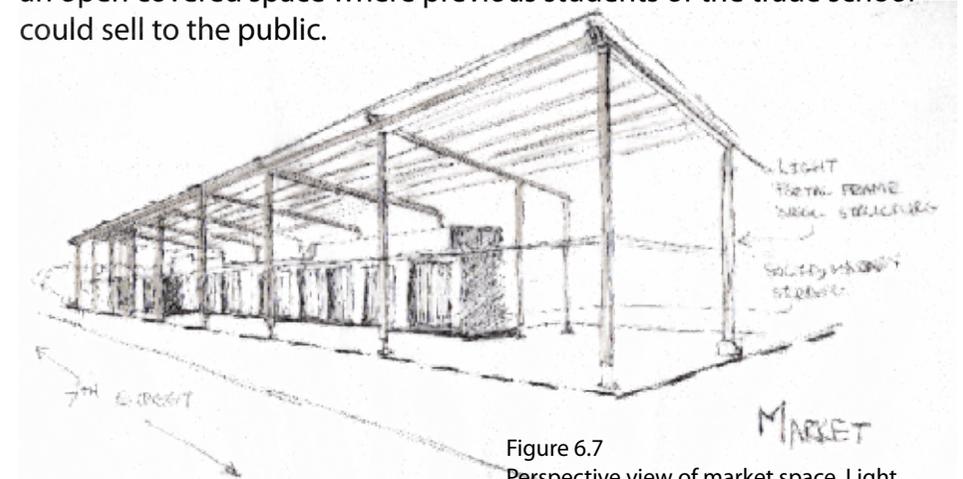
Perspective view of market space. Light portal frame roof structure with storage and trading space underneath. (Author, 2010).
